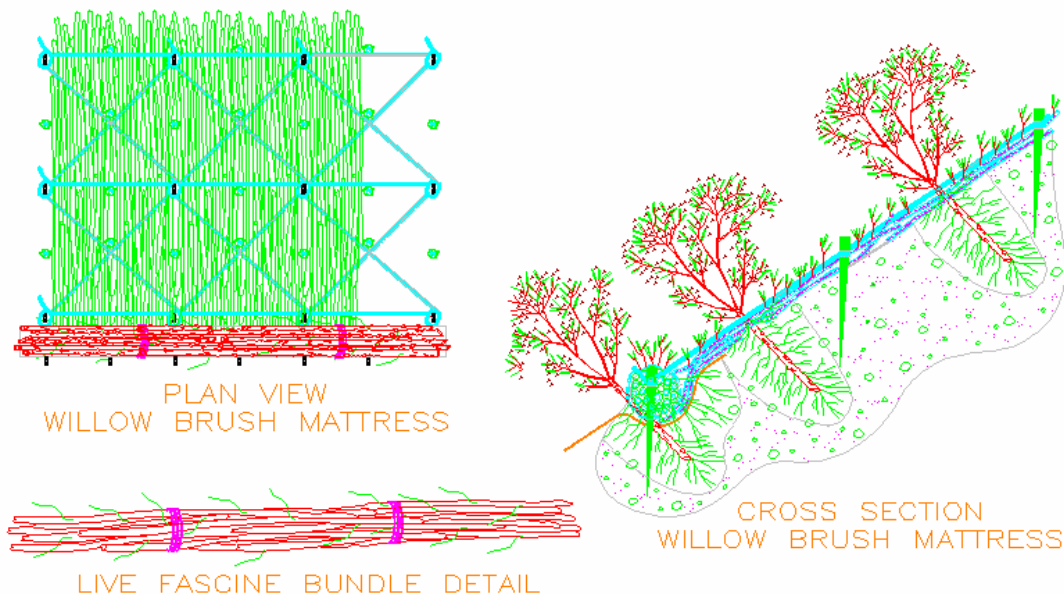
Willow brush mattress construction. Note that willow posts will not be leafed out nor rooting at the time of construction.
